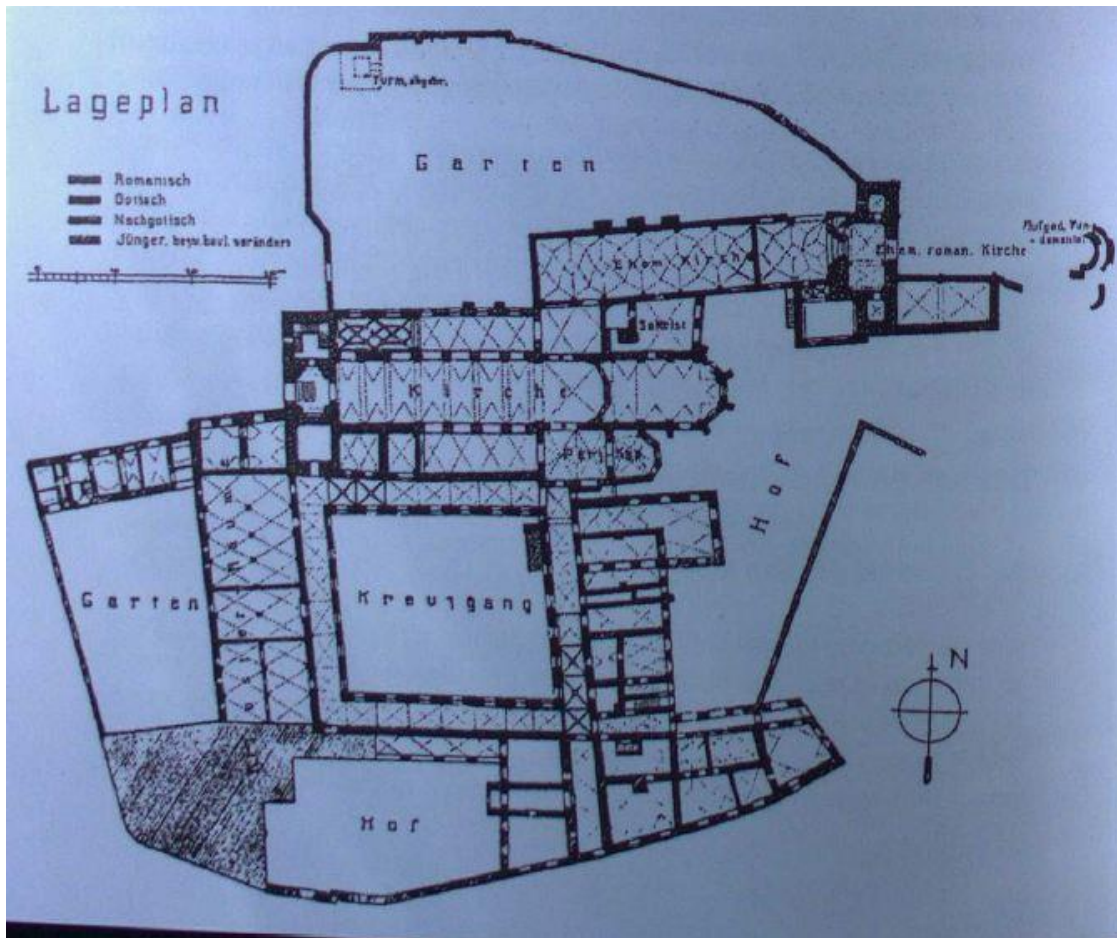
Floor plan of the Abbey of Niedernburg, Passau
